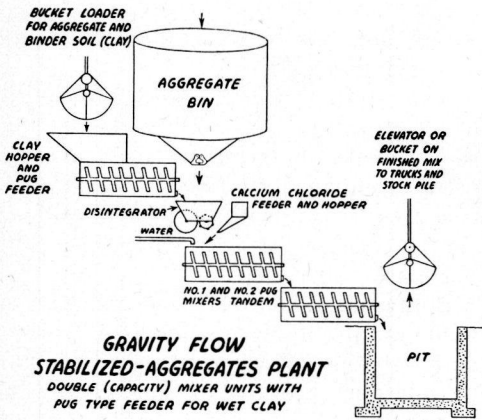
Typical Gravity-Flow Wet-Mix Plant
